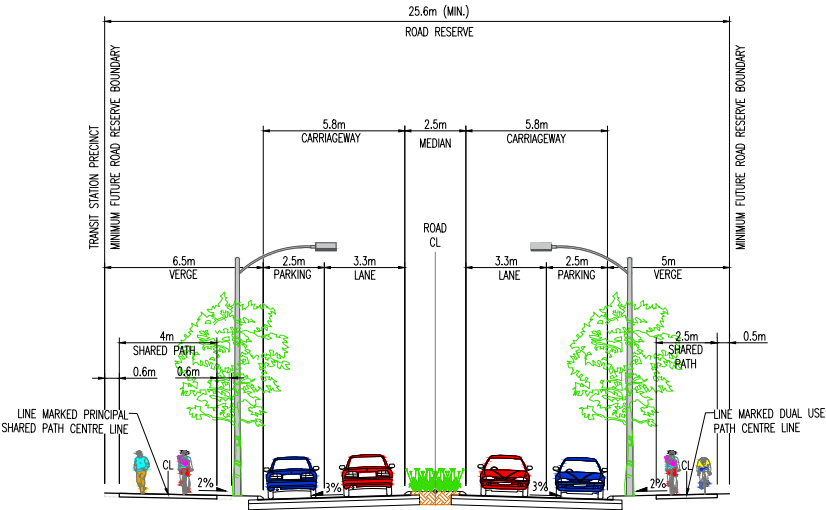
CROSS SECTION STONEY ROAD (DISTRICT CENTRE)
